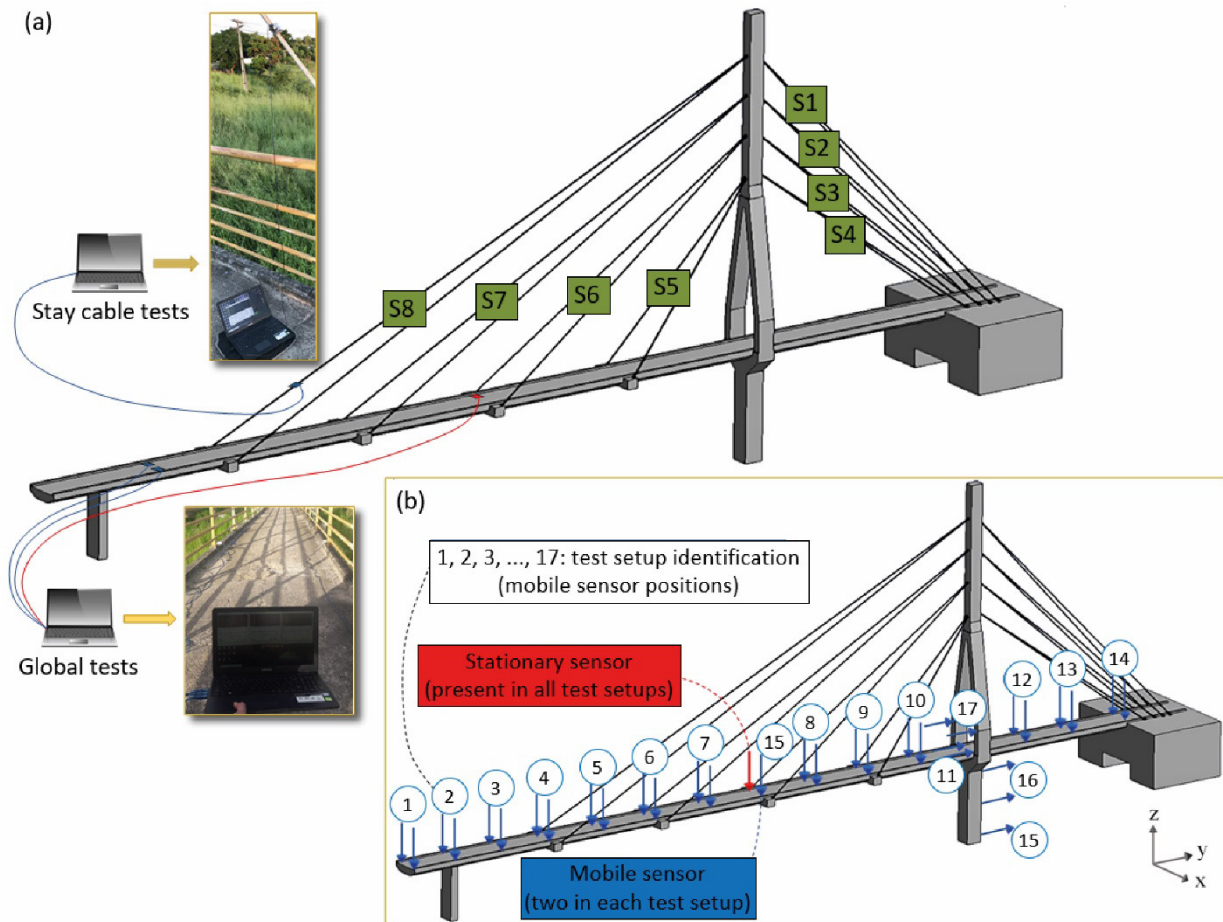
(a) Stay cable and global tests; (b) Test setups used in the global tests.
